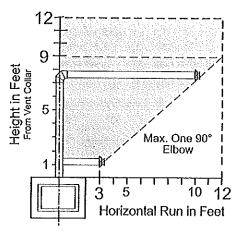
Horizontal Termination - 4/6 Pipe. Minimum 1 ft. rise required.
